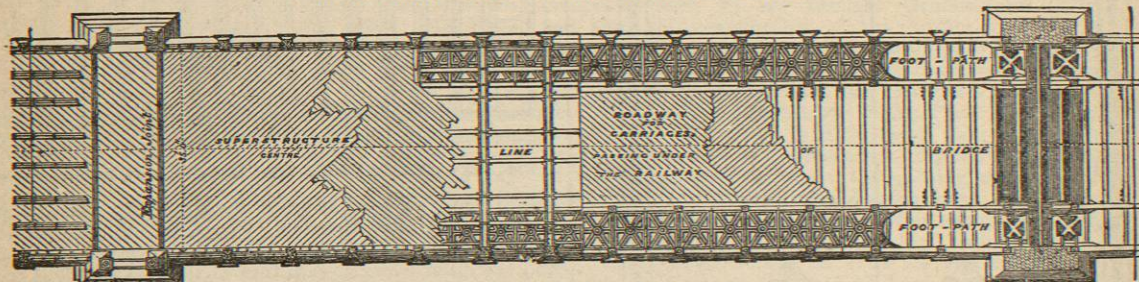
Plan of High-Level Bridge, Newcastle.
